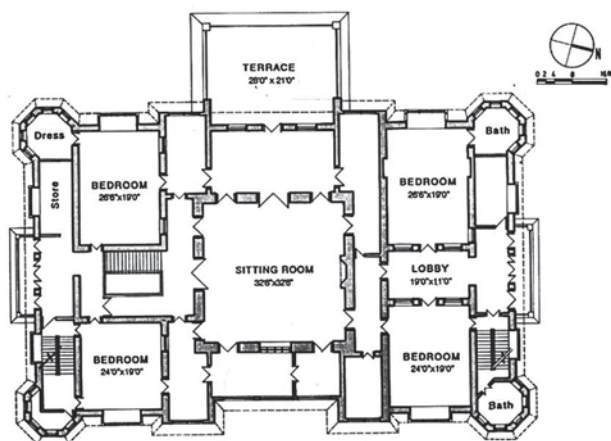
First Floor Plan of Mohatta Palace, Karachi.
